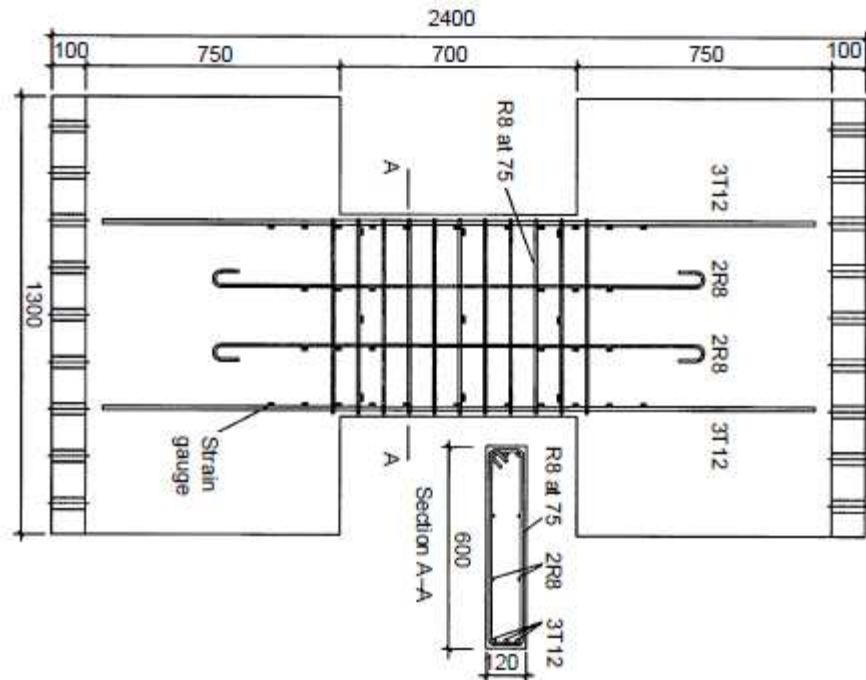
Typical Layout of Conventionally Reinforced Coupling Beam (Kwan and Zhao 2002)
